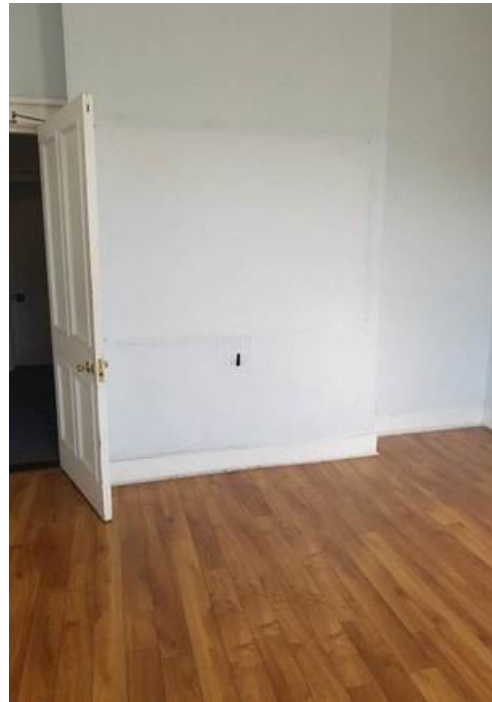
Bedroom with high ceiling, laminate flooring and without fireplace
